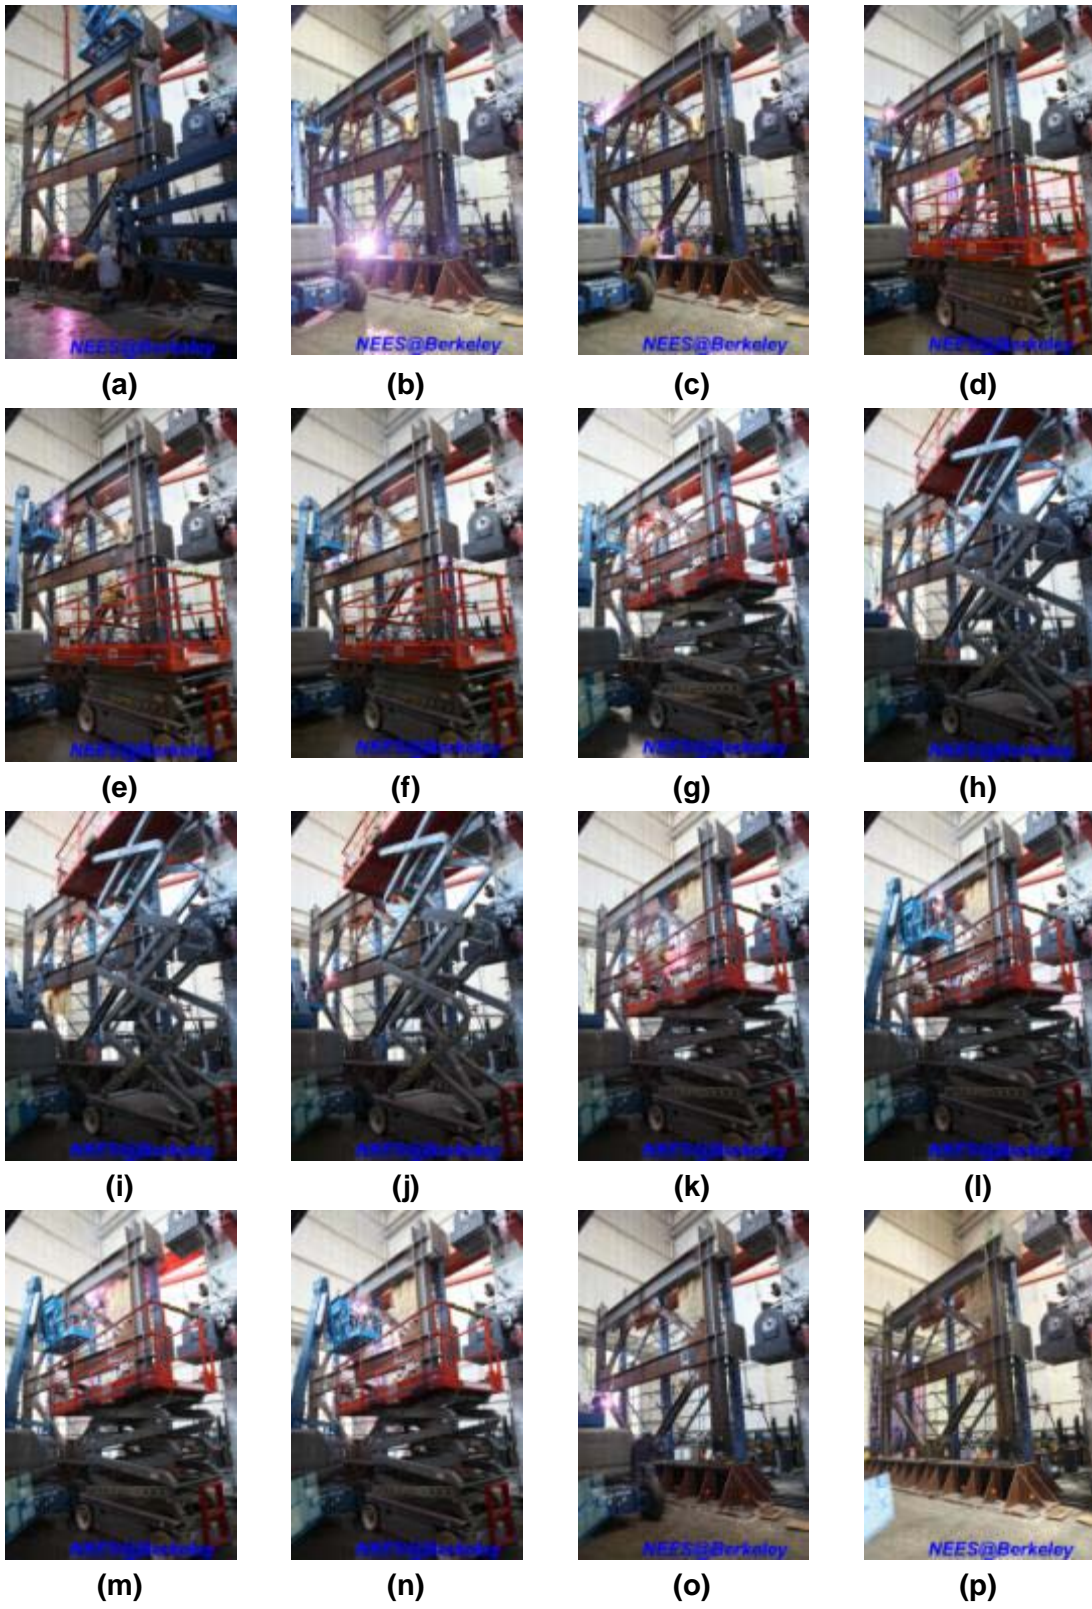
Key welding processes of TCBF-B-3 specimen
